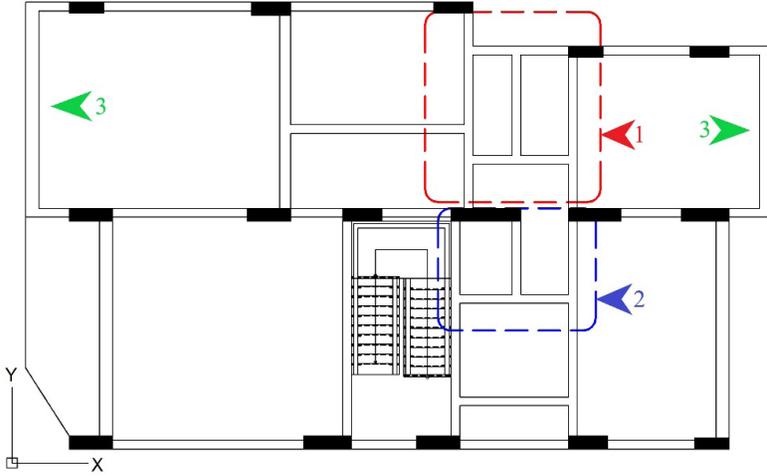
An RC Building Plan with All Columns Aligned in the Same Direction (Şahin et al., 2020)
